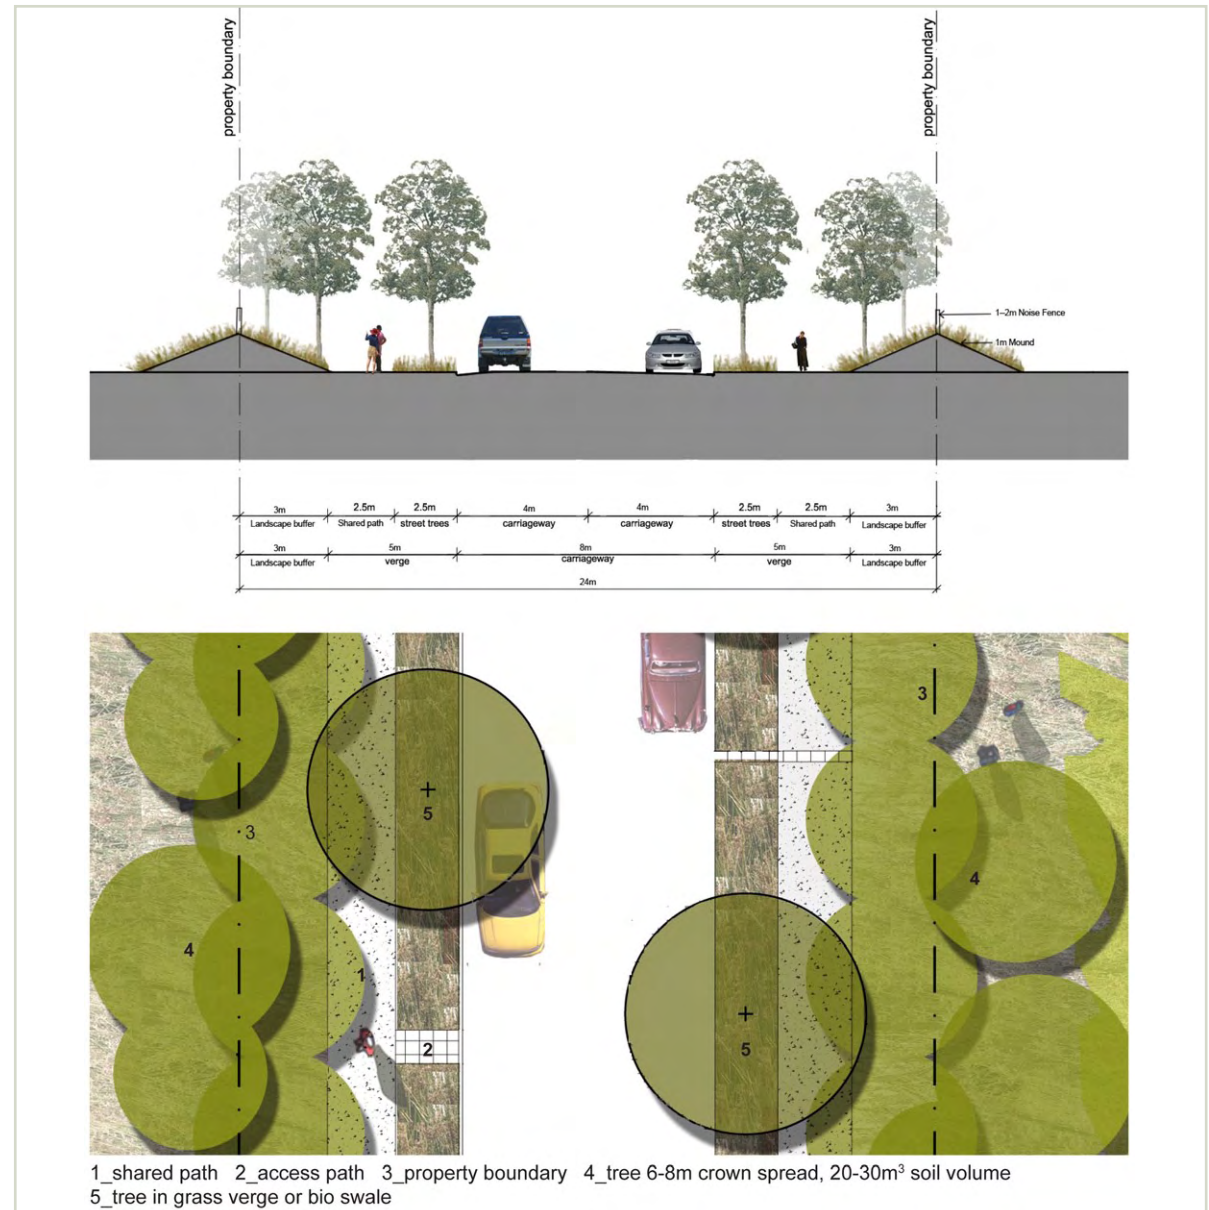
Collector Road A - 24m (Section 3-3)
